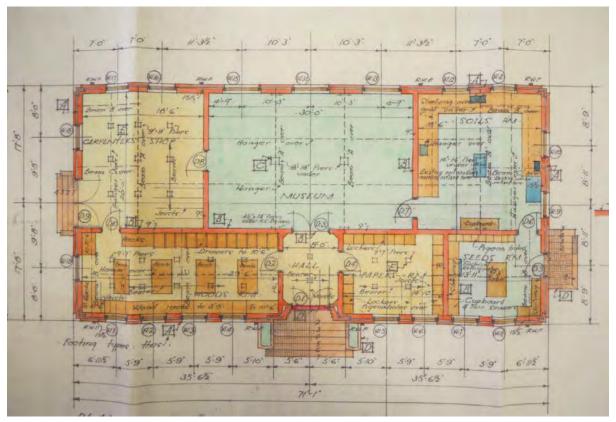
Museum building floor plan, details of Wood, Seeds and Papers Rooms (NAA #7689917)
